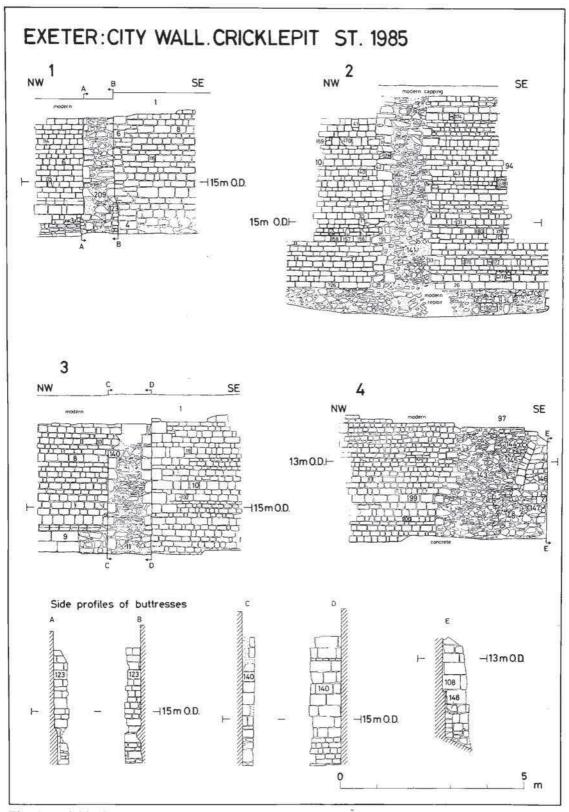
Cricklepit Street 1985, details of key areas of the elevations.
